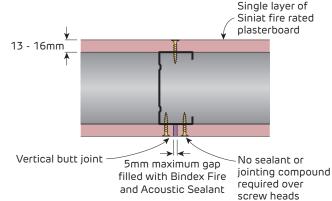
Vertical Joints in Single Layer Wall Systems
